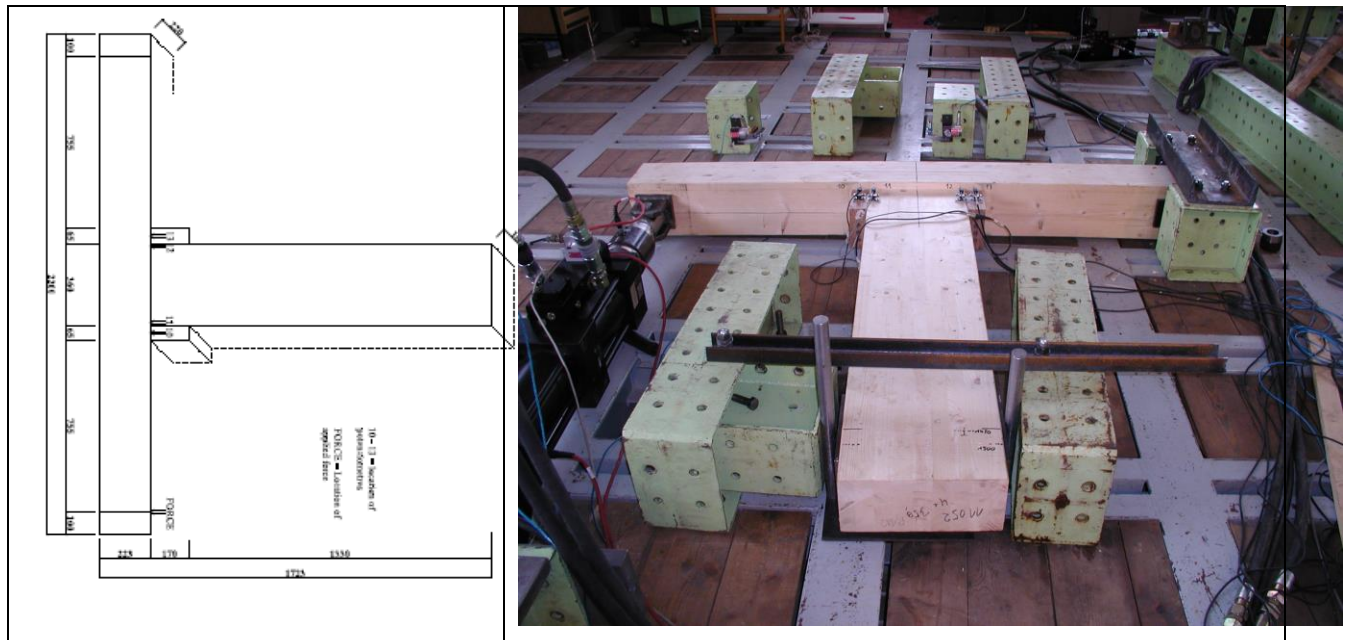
Schematic of the beam-to-column connection test setup. Mockup frame connection test.
